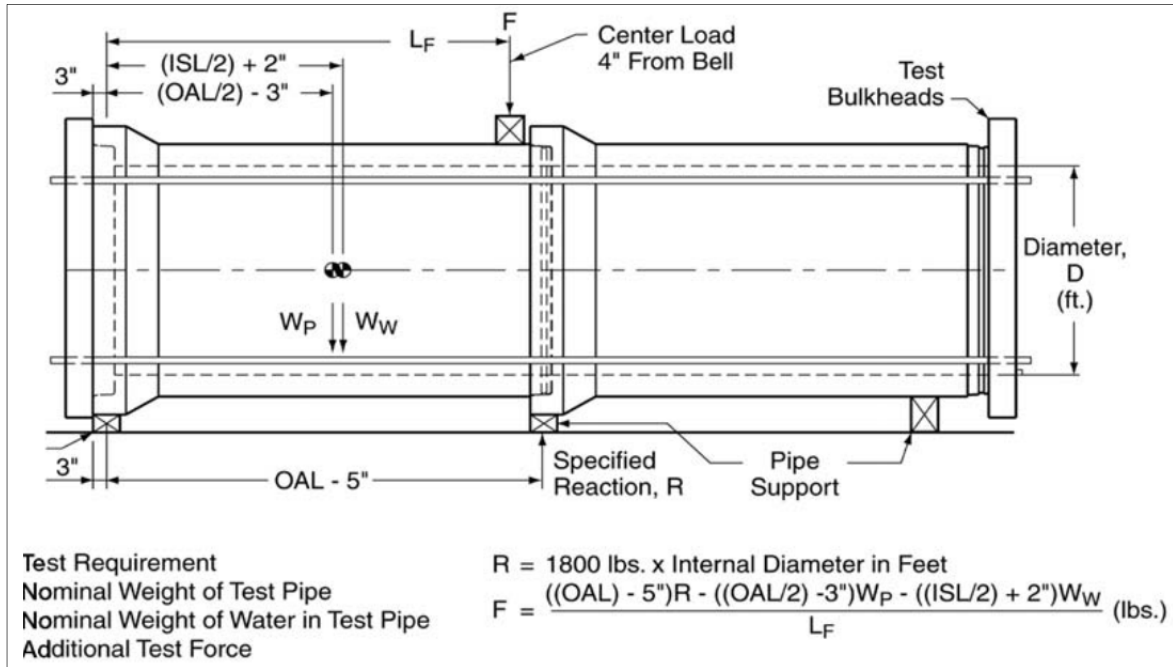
Illustration of vertical test load being applied during hydrostatic joint test. theyshall be constructed to prevent the pipes from rolling from the test position. Moisture or beads of water appearing on the surface of the concrete are not considered leakage.
